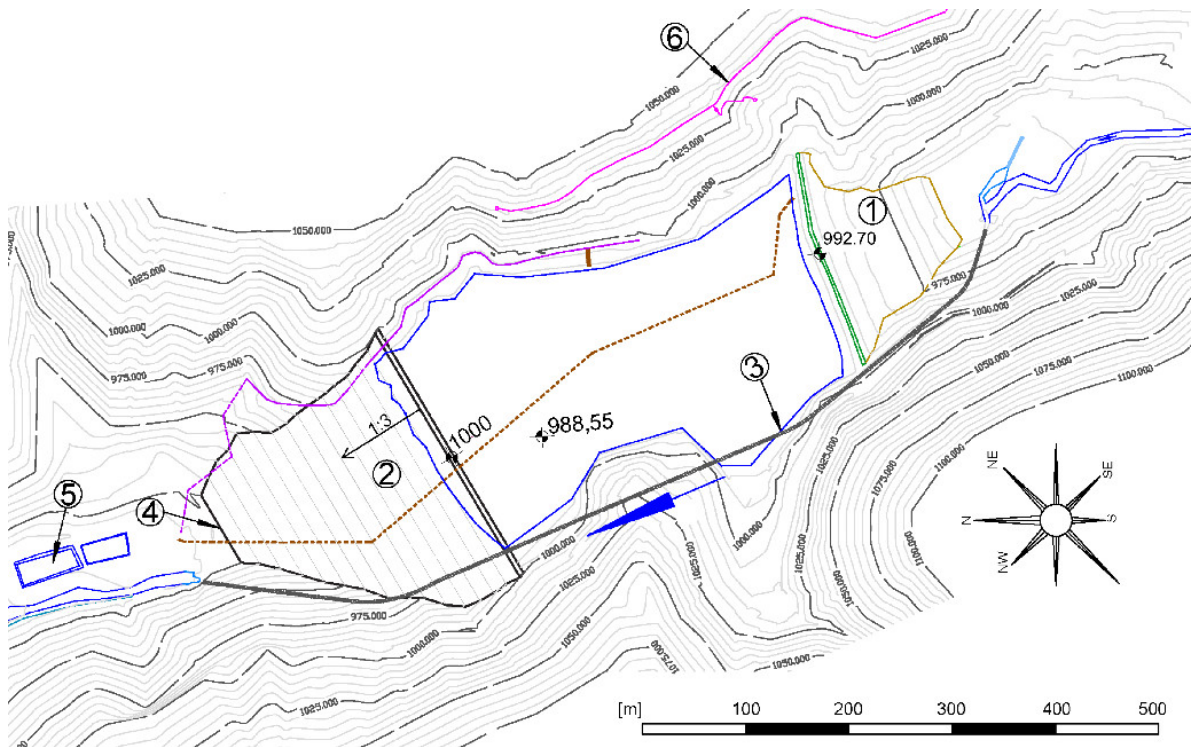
Layout of ‘Toranica 1’ TSF, according to the geodetic survey from September 2023. (1) upstream or retention or diversion dam, (2) downstream or tailings dam, (3) diversion tunnel, (4) gabion wall to protect the exit structure of the tunnel, (5) sedimentation tanks for drained and treated water, (6) pulpline.
